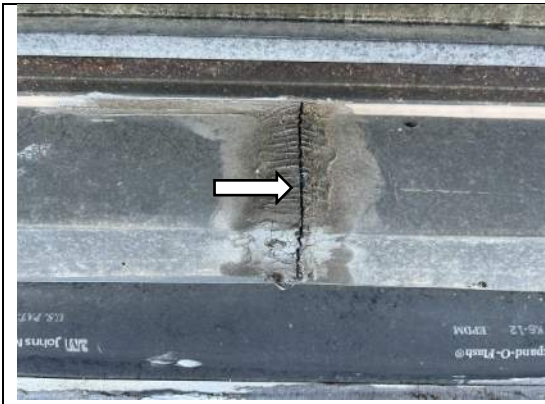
View of failed lap seam weld at sill flashing located beneath clerestory window. Note: Condition typical at all sill flashing joints.
